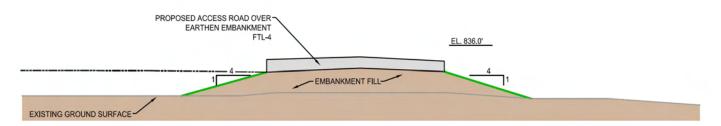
Fort Loudoun Dam – Raised Access Road Concept
